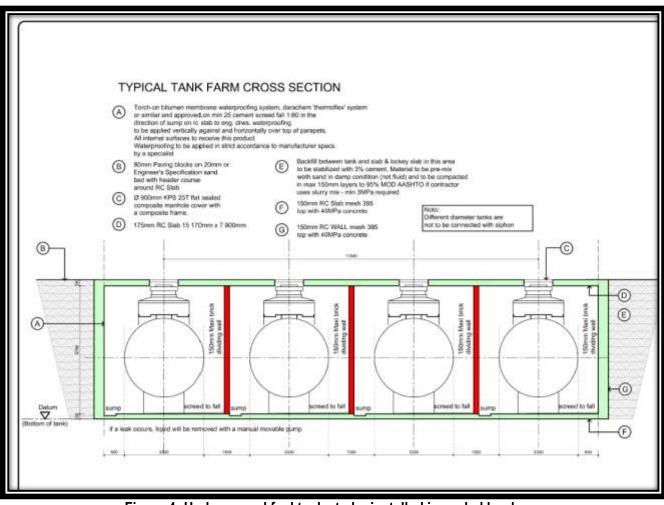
Underground fuel tanks to be installed in sealed bunkers.
